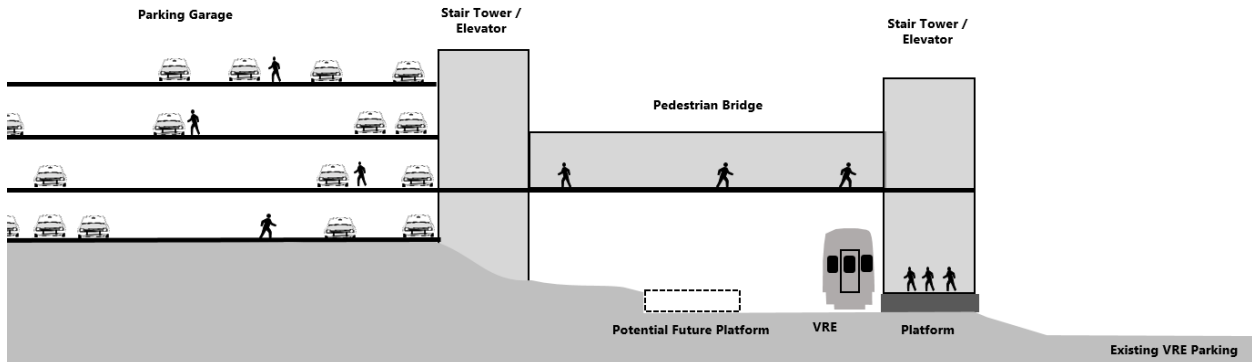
Concept for Pedestrian Bridge Connection between VRE Parking Garage and Platform
